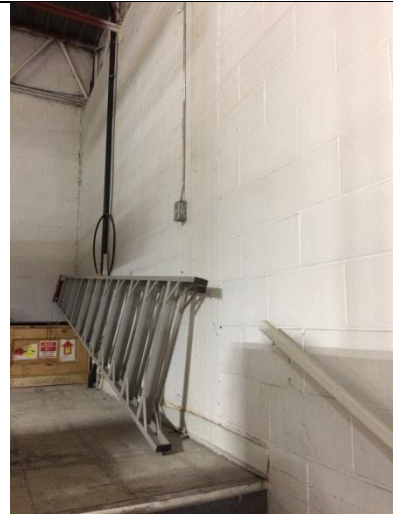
Non-lead containing white paint on cinderblock walls. Cinderblock walls may contain vermiculite.
